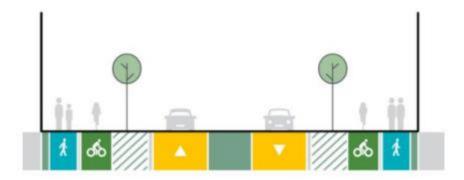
Indicative design between Kahikatea Flat Road and Postman Road – 24m cross section
